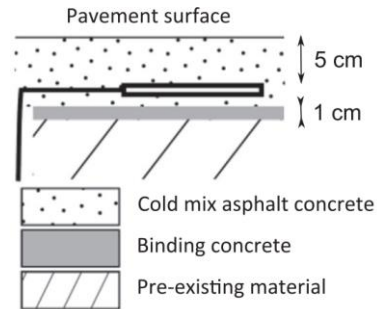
Cross-section detail of pavement sensor filling materials [3.15].
